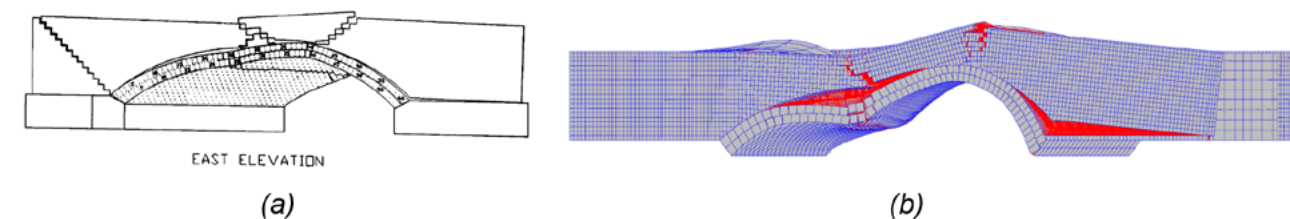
(a) Experimental failure mode; (b) Numerical deformed shape at failure for skew bridge "Bridge 3-3" (Hodgson, 1996).
